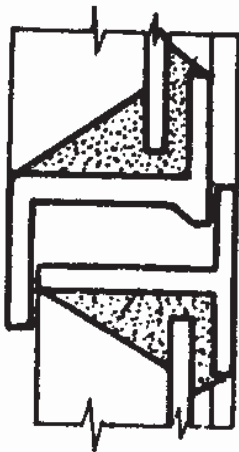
Detail Through Bottom of Top-Hung Ventilator
